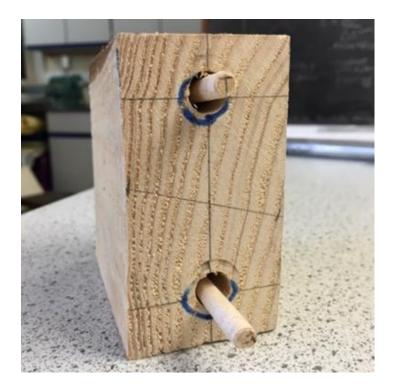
Photo of two micro clear specimens cored from a block cut from a structural sized joist (specimens 'A' top, and 'B' bottom)
